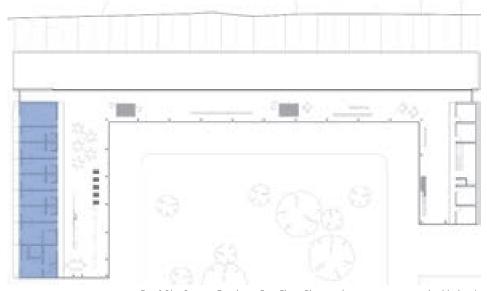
Spring Gardens: First Floor Plan, with mezzanine suites highlighted
